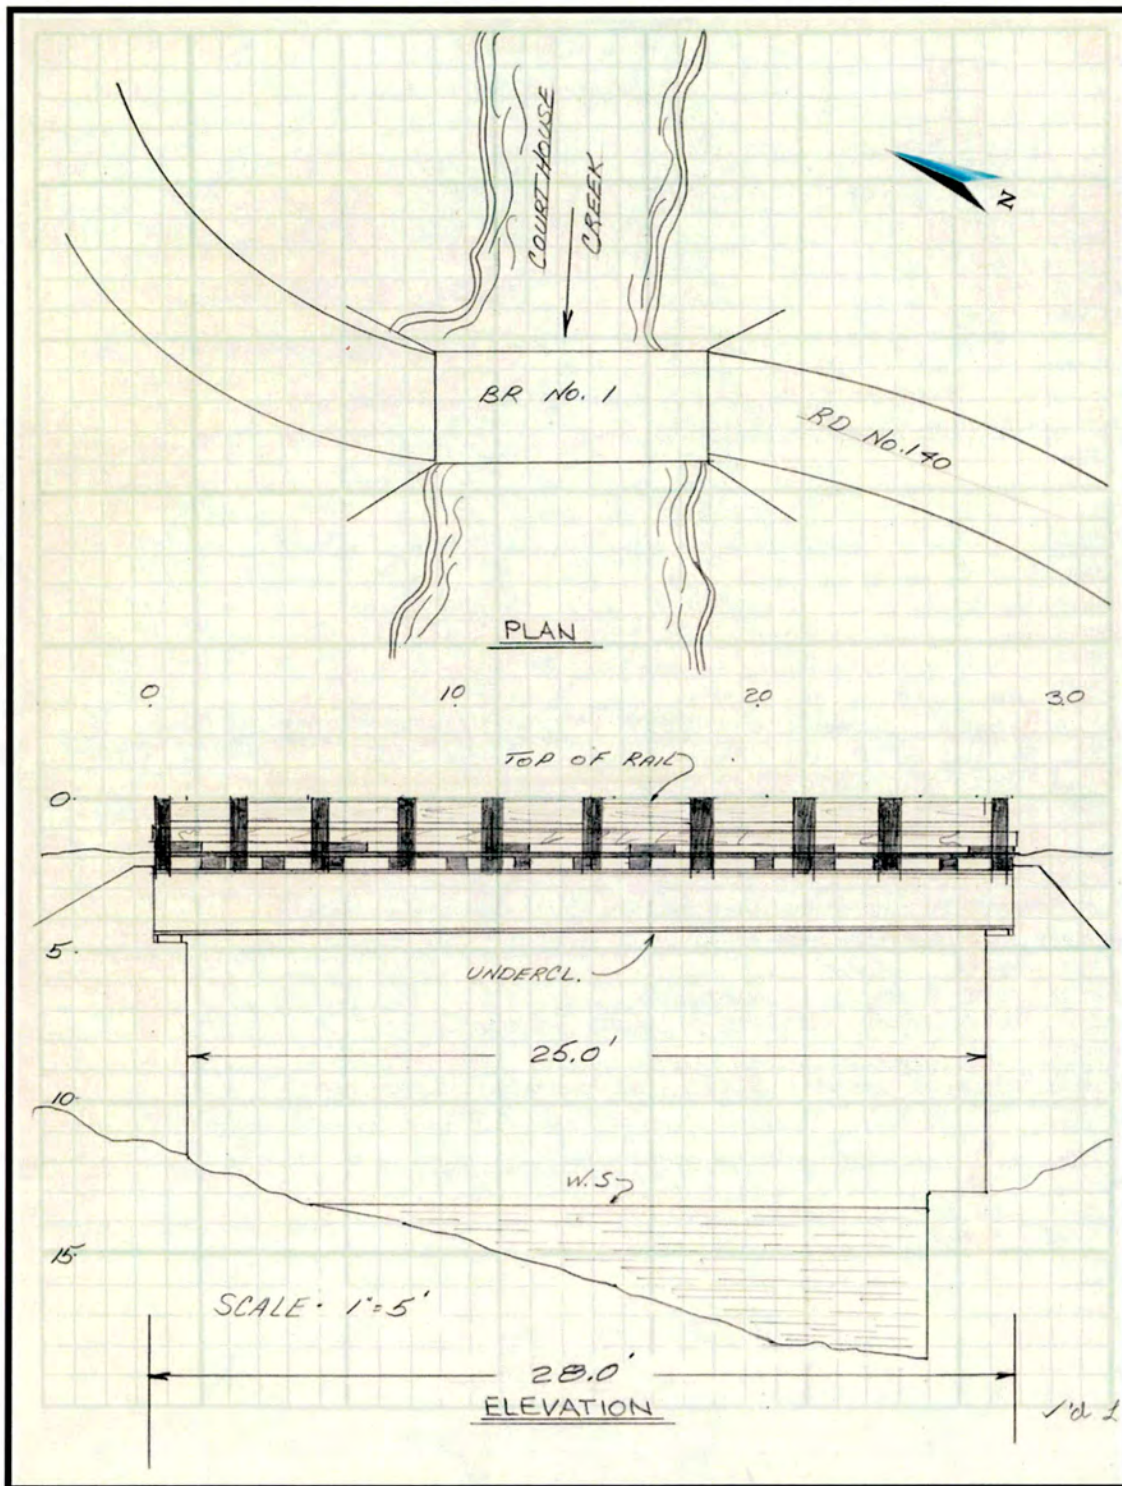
Plan (top) and northeast profile (btm) drawings of Bridge 140-1.5 on Courthouse Creek. Courtesy of USFS Engineering.
